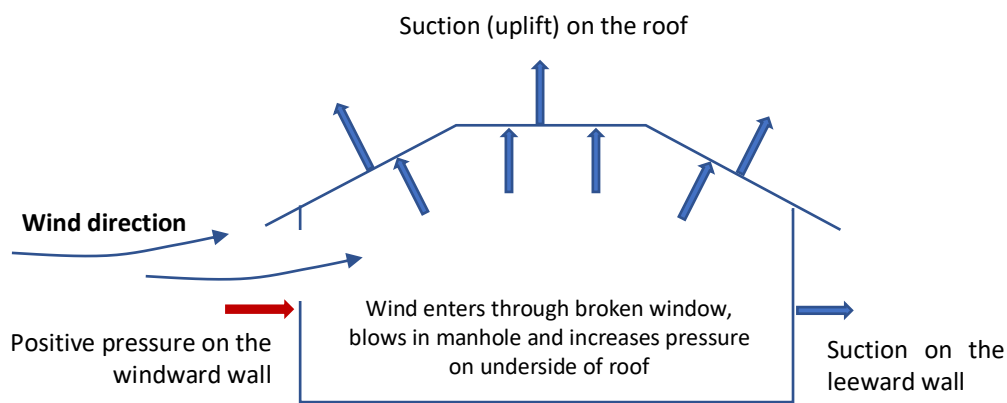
Typical internal pressures on a building with an opening on a windward wall
